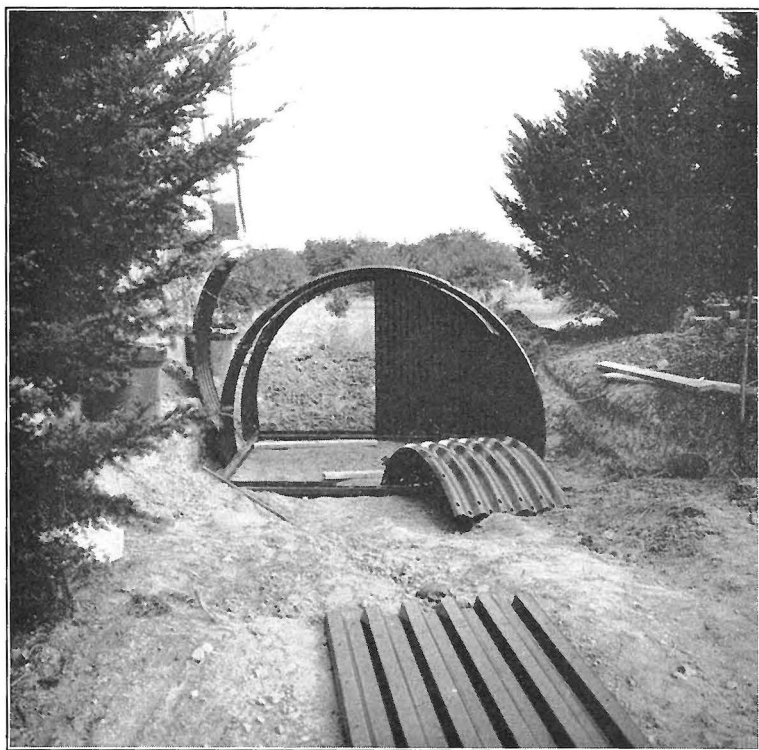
All-steel storage under erection. Note channel iron and curved, corrugated sheets. Three sheets comprise one section.
